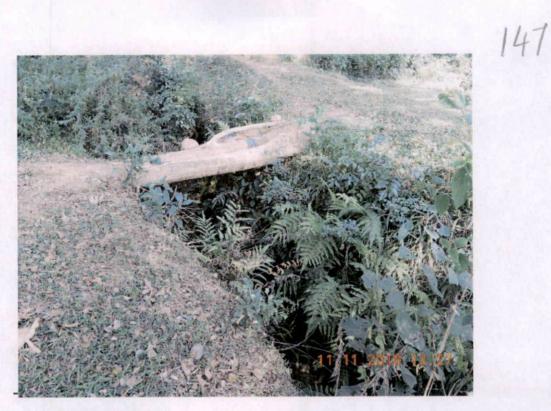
Bridge made across the Elephant-proof Trench at Chethalayam, Kurichiyat
